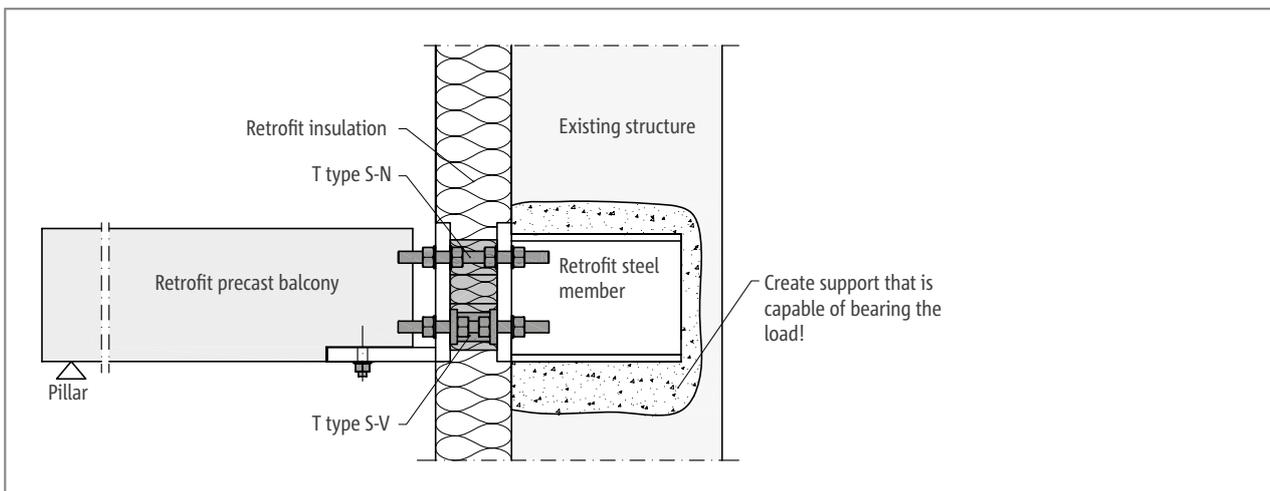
Schöck Isokorb® T type S-N and T type S-V: Retrofitted supported precast balcony; connected to retrofit steel beam
